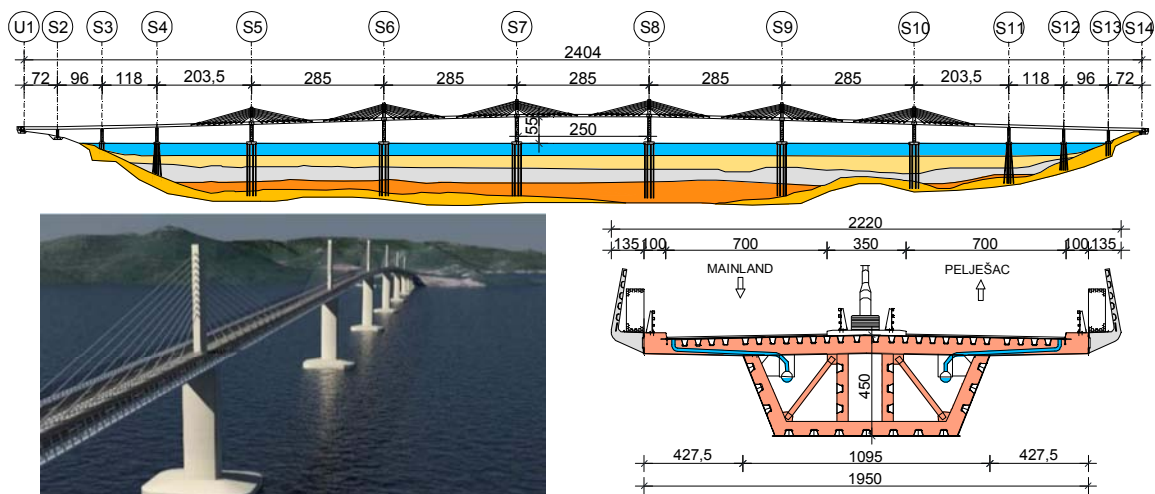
Longitudinal layout, computer rendering and suspended cross section of the final solution for Pelješac bridge: multi-span semi-integral extradosed bridge
